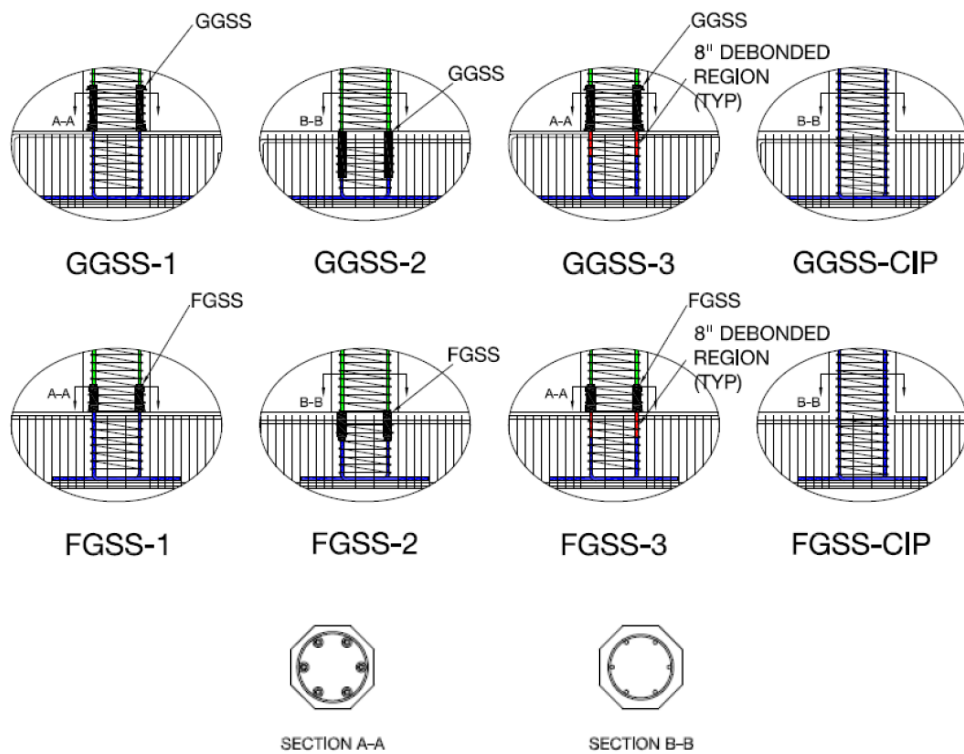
Configuration of test specimen alternatives (Pantelides, et al. 2014)
